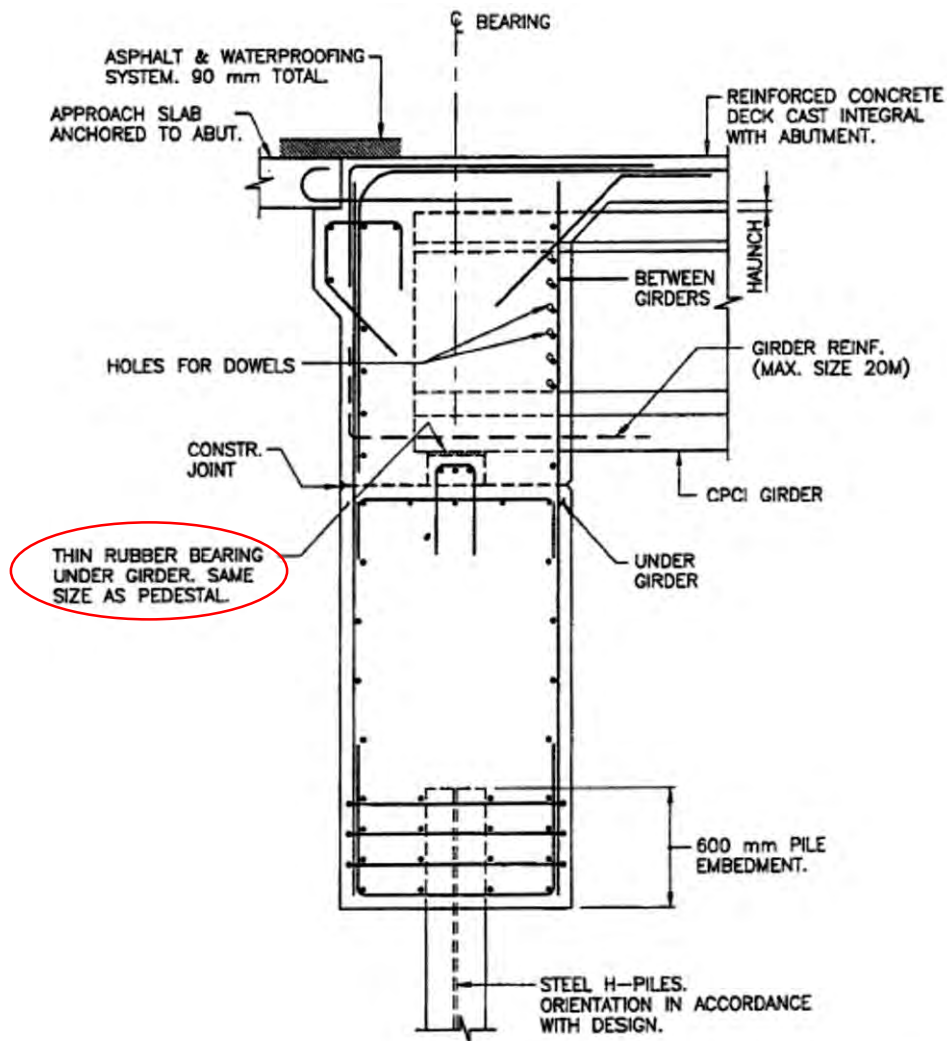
Integral abutment with CPCI girder and concrete deck - Ontario Ministry of Transportation (Husain & Bagnariol 1996)
